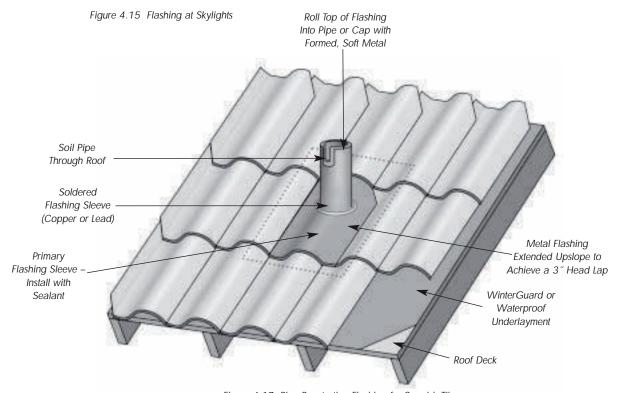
Pipe Penetration Flashing for Spanish Tiles
